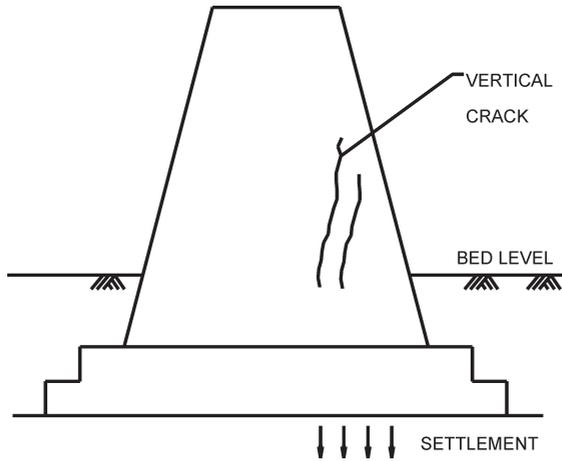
Vertical cracks in pier due to settlement
